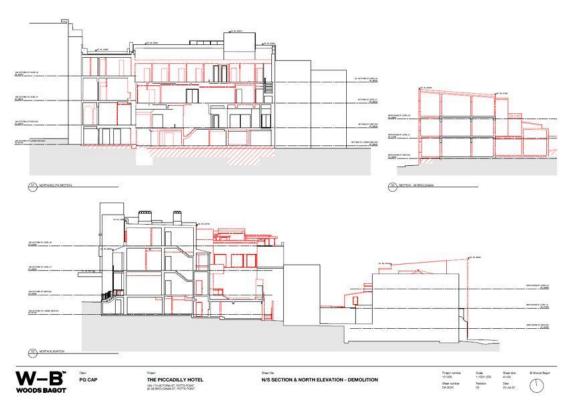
Proposed north-south section and north elevation demolition drawing extracts
